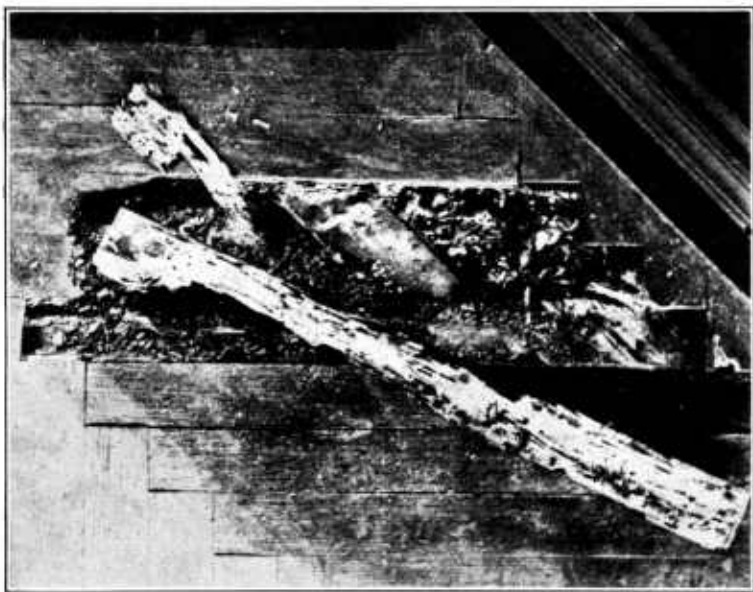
Quartered-oak flooring damaged by the subterranean termite *Reticulitermes flavipes* in an infested building, Washington, D. C., 1915
